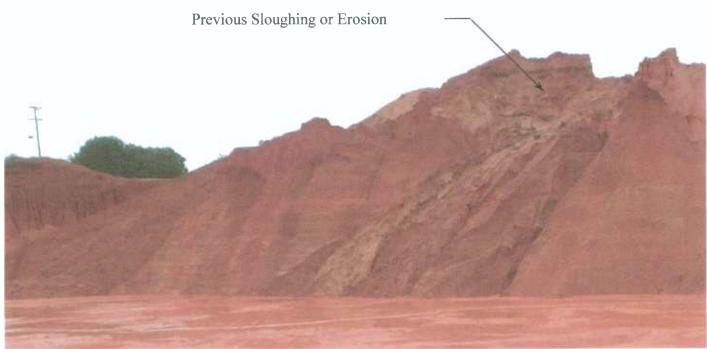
View of the pit wall on the north side of the failure looking northeast. This view also depicts some previous erosion and sloughing adjacent to the failure.
